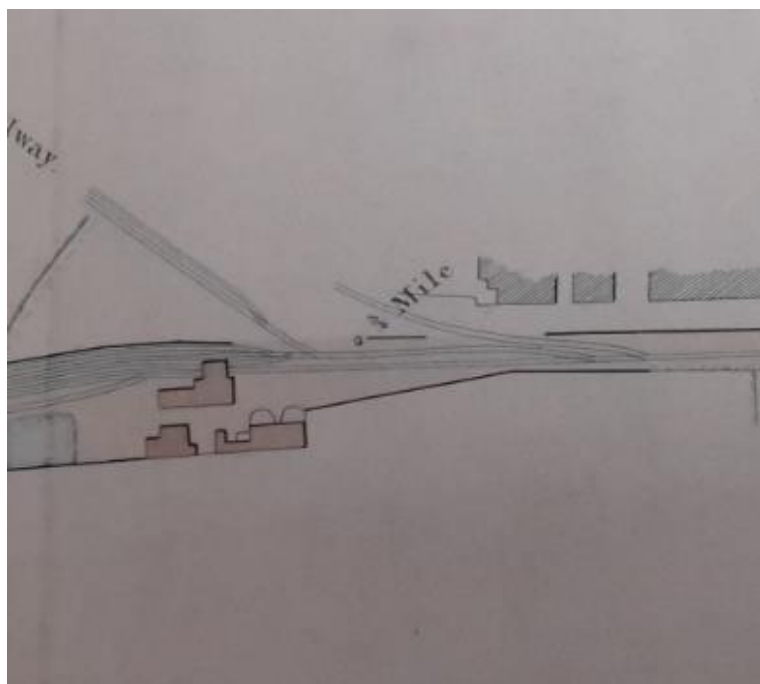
An extract from Thomas Dixon's plan of 1839 showing the enginemen's house(s), the engine house and another building, plus the reservoir. The main sidings heading off are linking Black Boy to the Eldon Branch Railway (TNA RAIL 1037/453)
